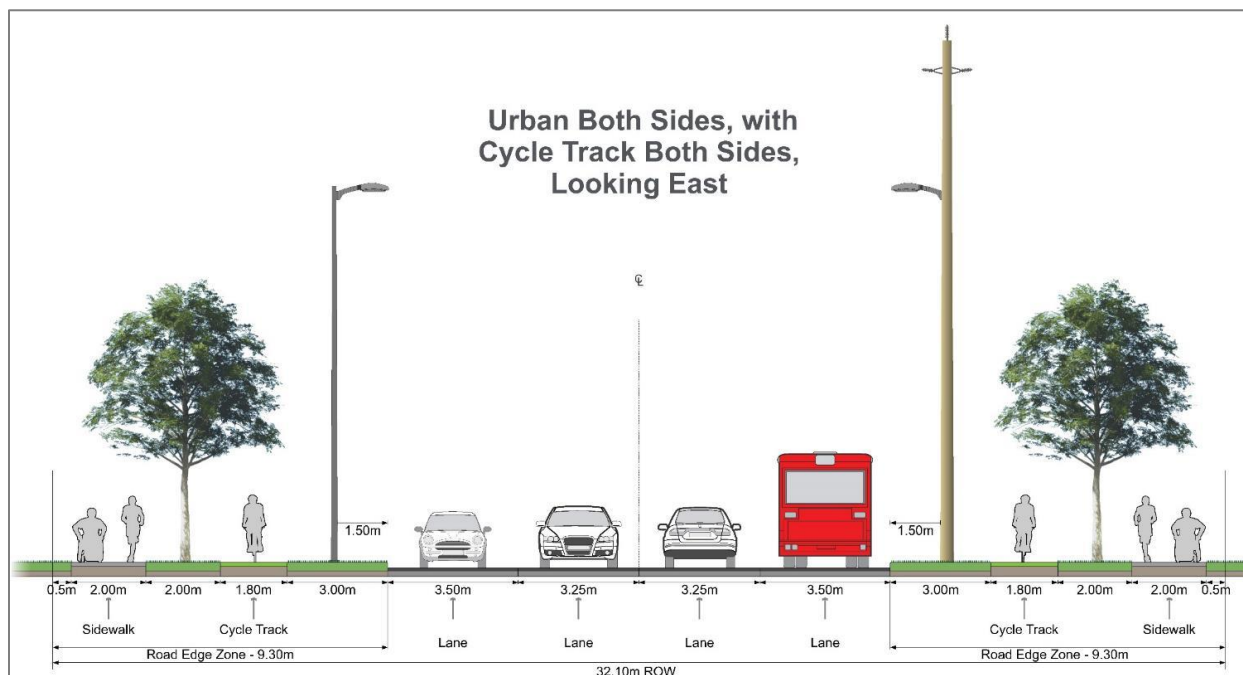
Leitrim Road – Albion Road to Existing Leitrim Road
